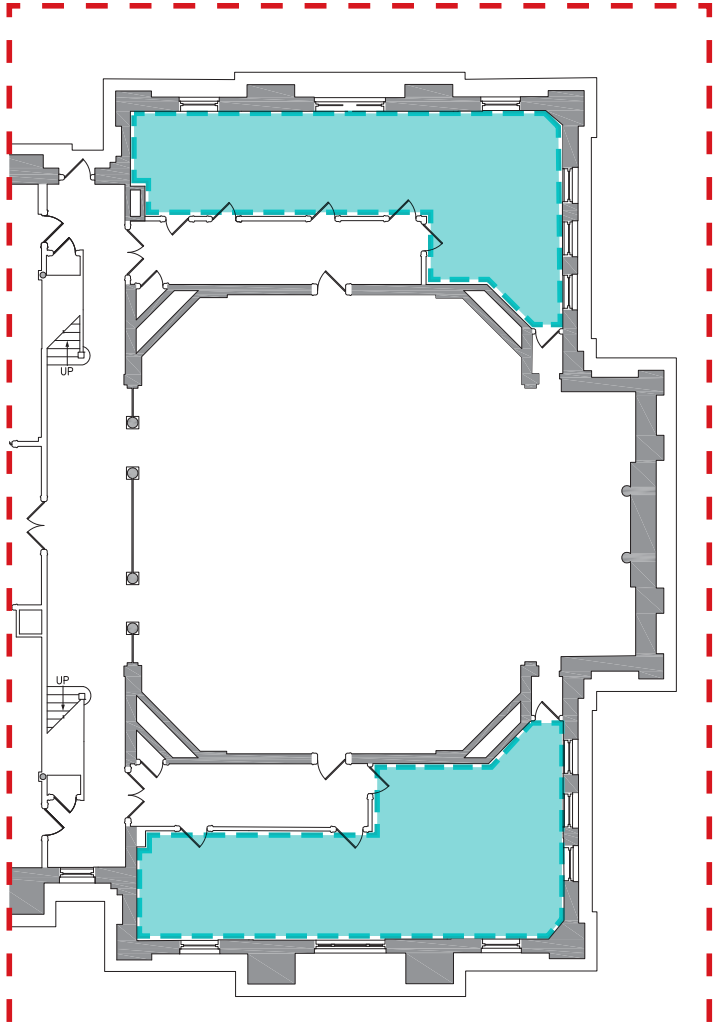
Second Floor Level House Chamber Support Space, North [Phase III - 1917].
